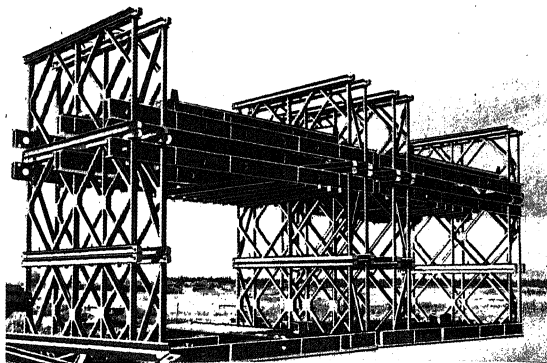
Constructing a ship-building gantry from panel bridge parts. To complete gantry, a monorail and traveling crane will be hung from overhead transoms.
